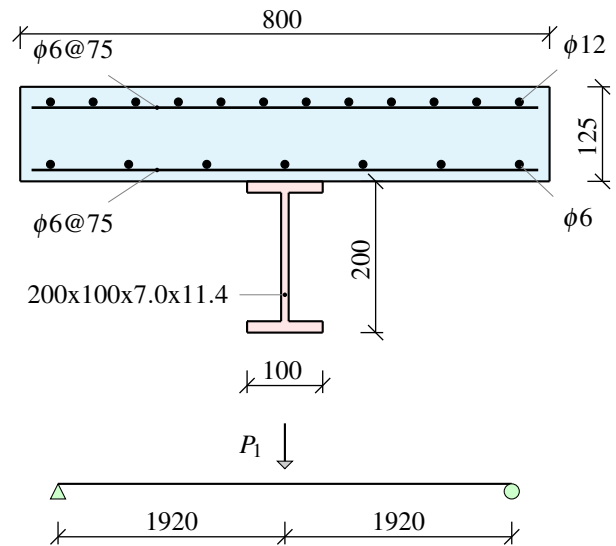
Cross-section and loading - specimen SCB-3 (Nie and Cai 2003).
